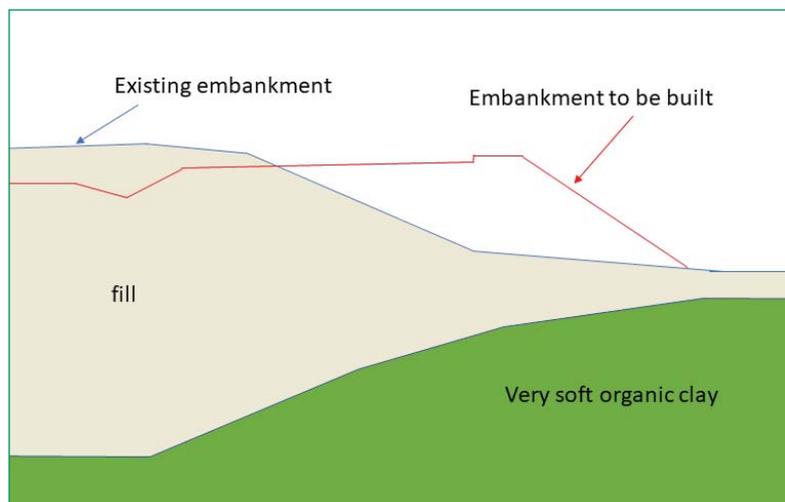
Simplified cross-section of the existing embankment and the extensions to be built on very soft organic clay.
